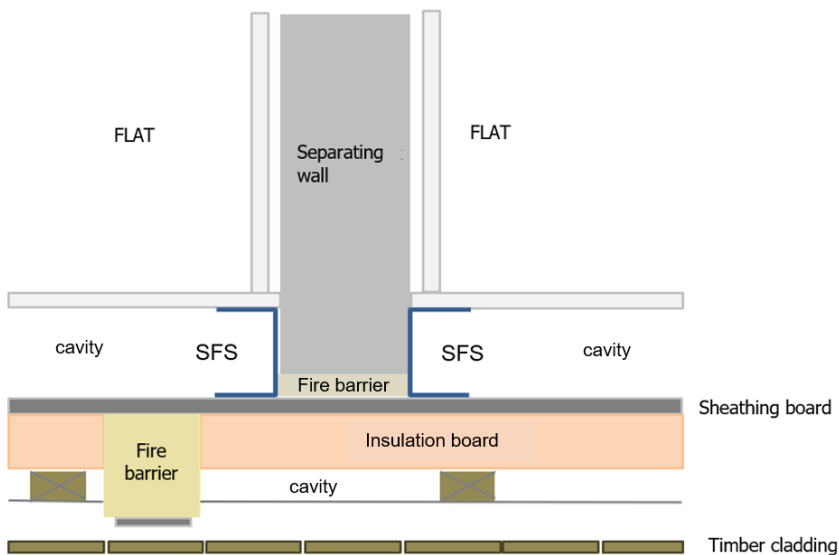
Cavity barrier mis-aligned behind timber cladding (plan view)
